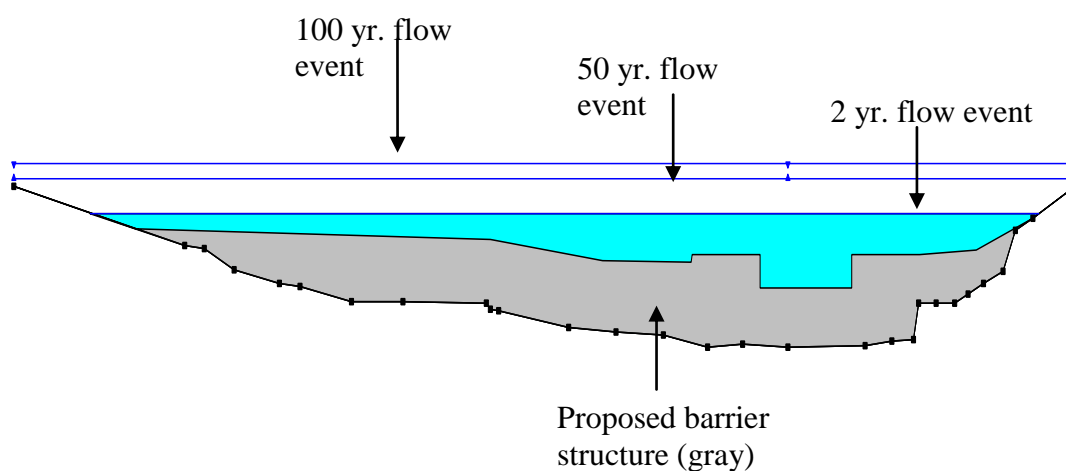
HEC-RAS modeled cross section water surface elevations for proposed barrier site conditions.
